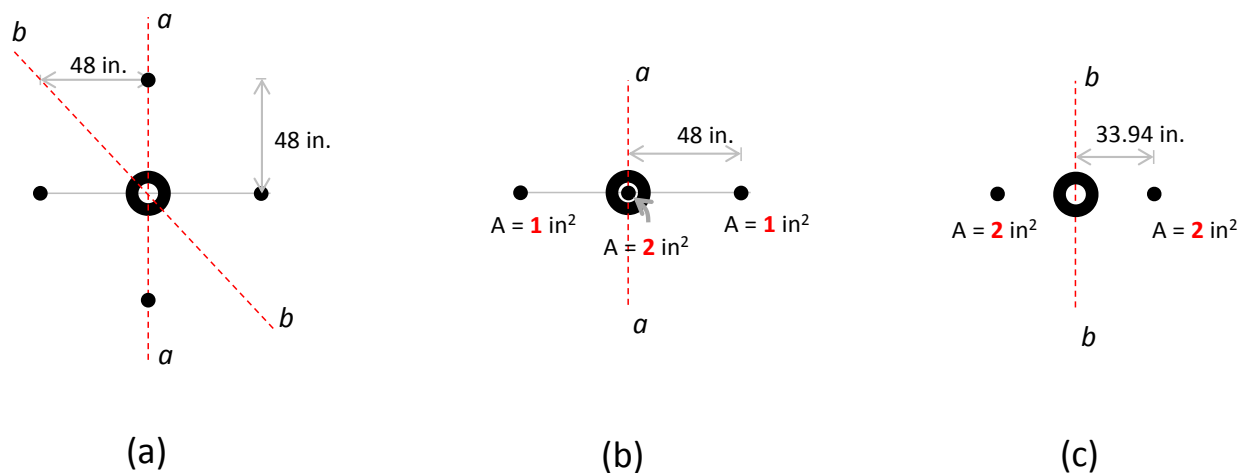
(a) Plan showing central strut and cable stays (b) Case A: Plan of planar model showing bending axis a-a; and (c) Case B: Plan of planar model showing bending axis b-b
